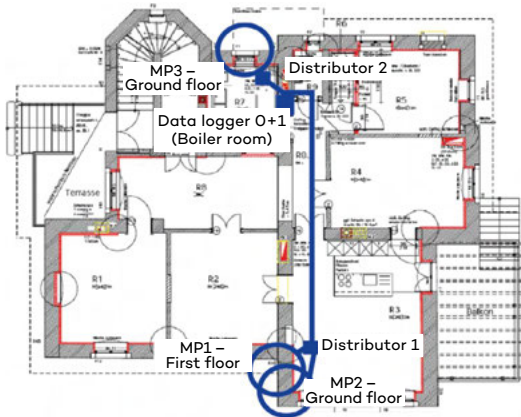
Arrangement of the measurement section on the first floor as well as the insulated sensors at the end of wooden beam
